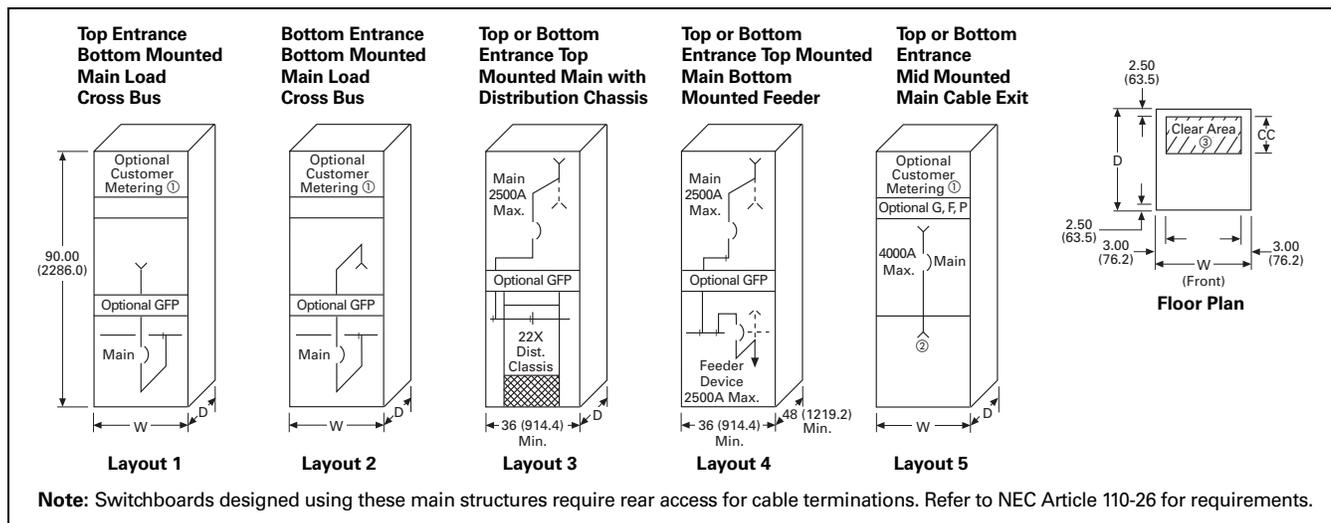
Main Section Layouts—Dimensions in Inches (mm)
